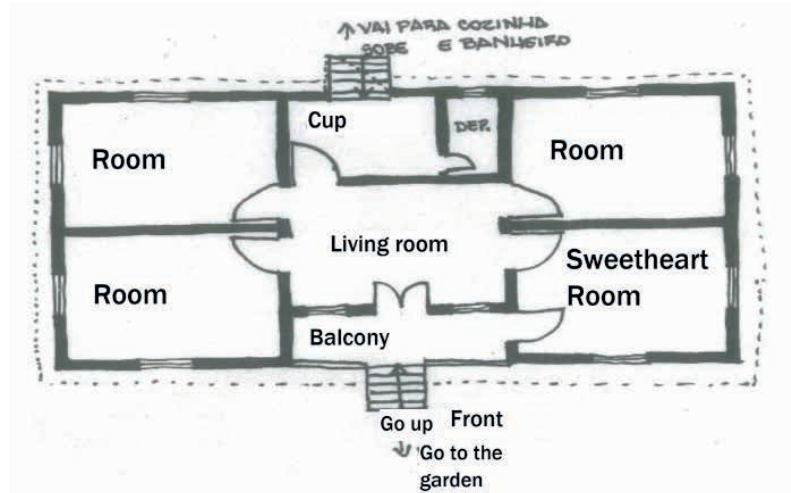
Sketch of a typical Pomeranian house floor plan.
